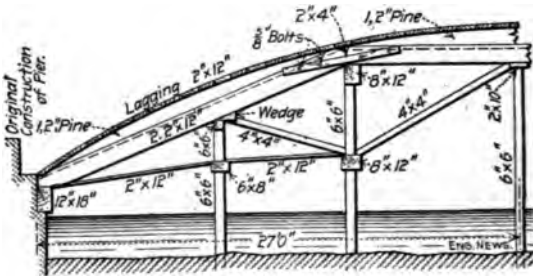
Center for 54-Ft. Arch at Plainwell, Mich.
